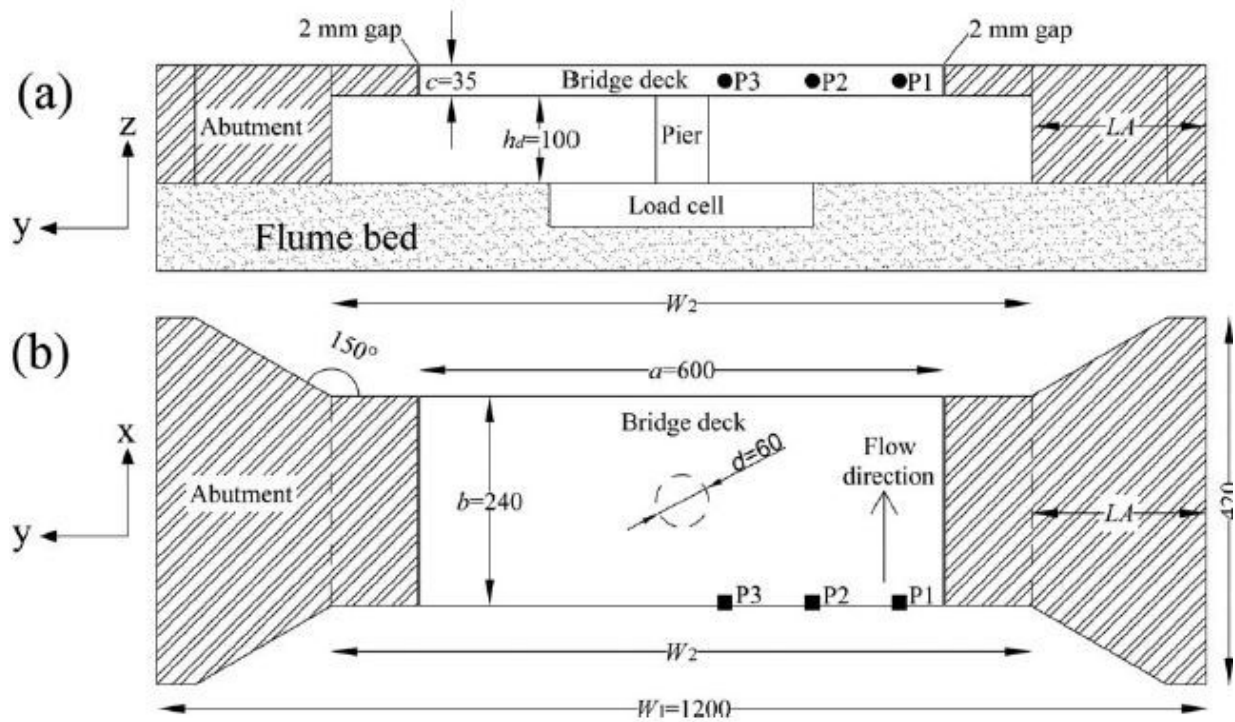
Elevation (a) and plan view (b) of model bridge tested by Cheng et al. (2018) and Farfizi et al. (under review). Dimensions are in mm and the scale factor is 1:40.
